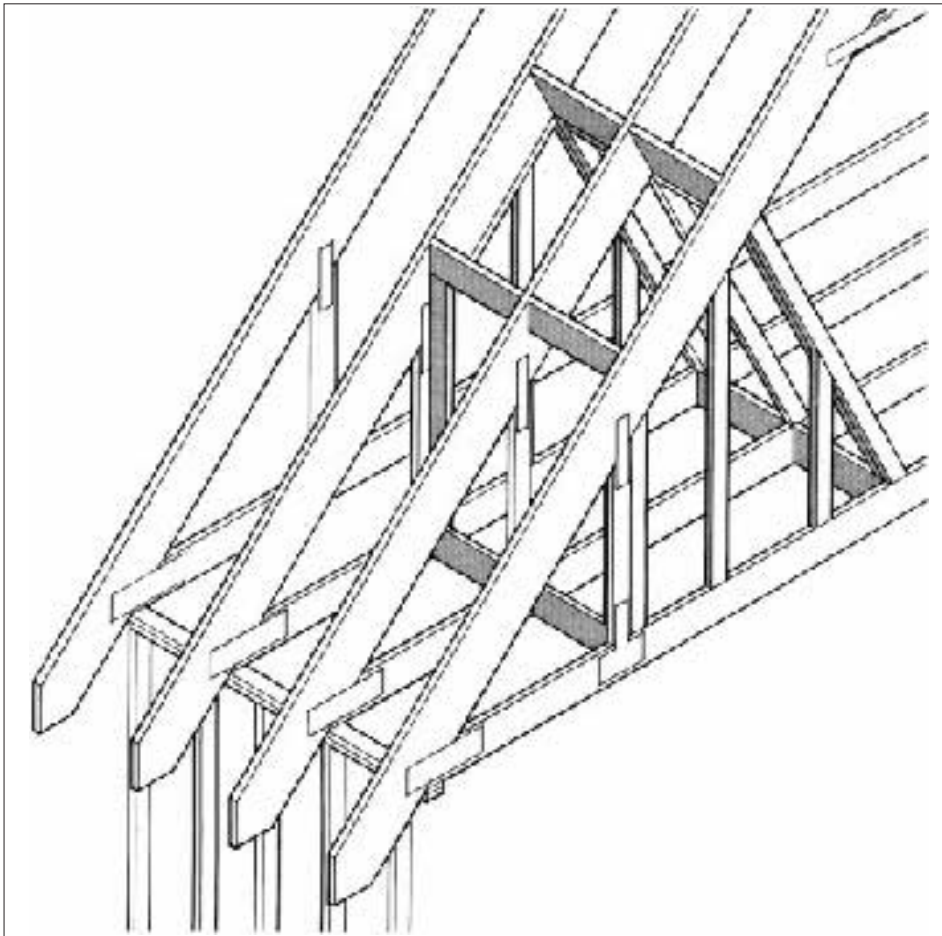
Manufactured roof windows come in standard widths to fit between trusses. The members with plates on them are existing roof trusses. The darker members are framing added for a light well.
